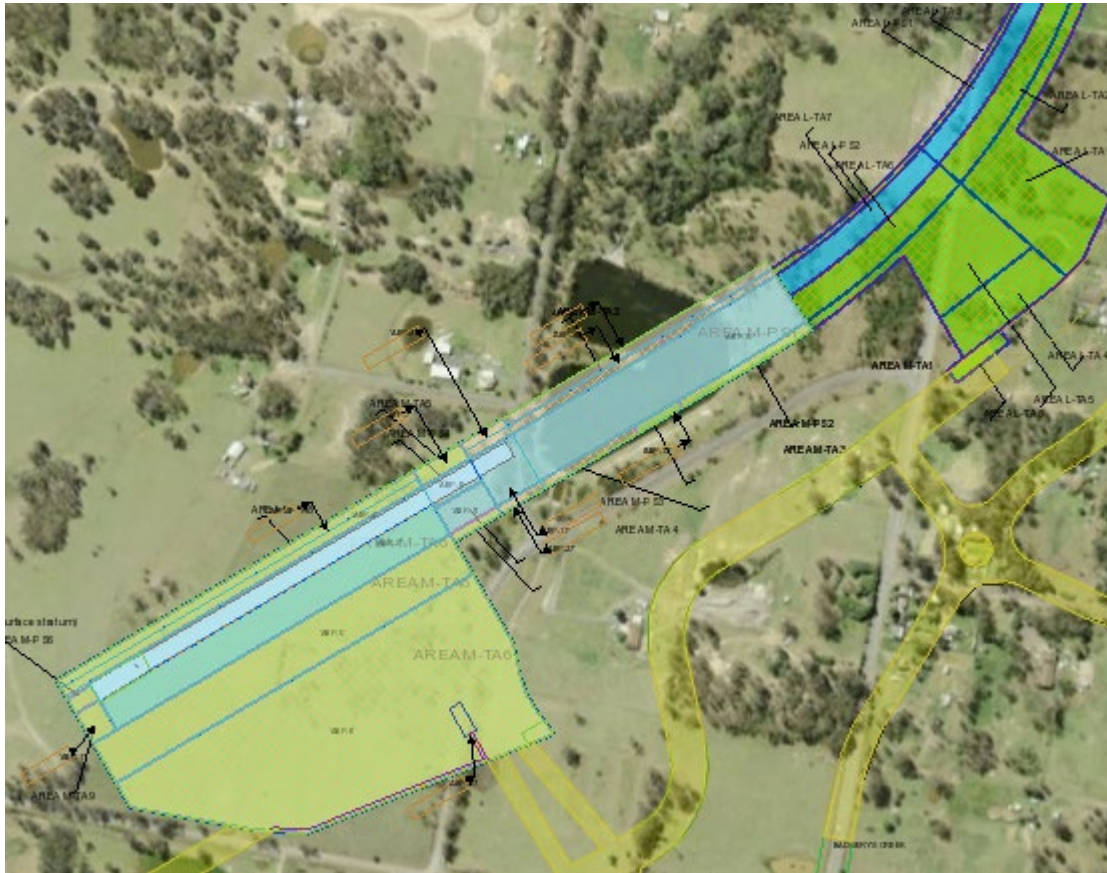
Airport Business Park and Tunnel Portal indicative construction site
